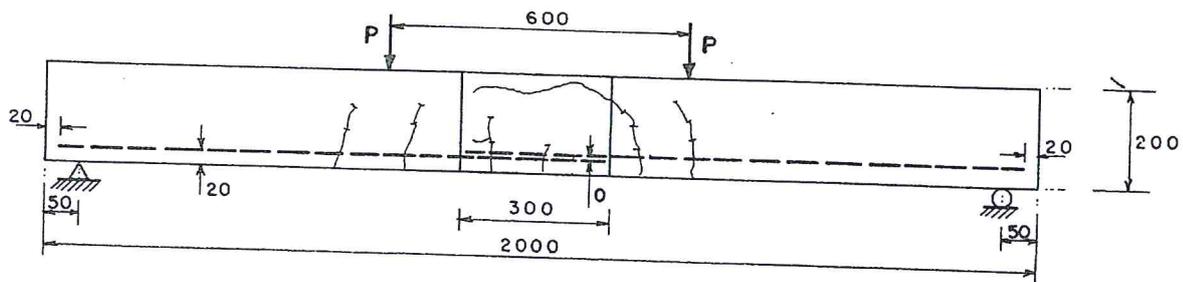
Typical cracking pattern of slabs with small splice-bar spacing [Slab S2-14-300-30 (1 in. = 25.4 mm)]
